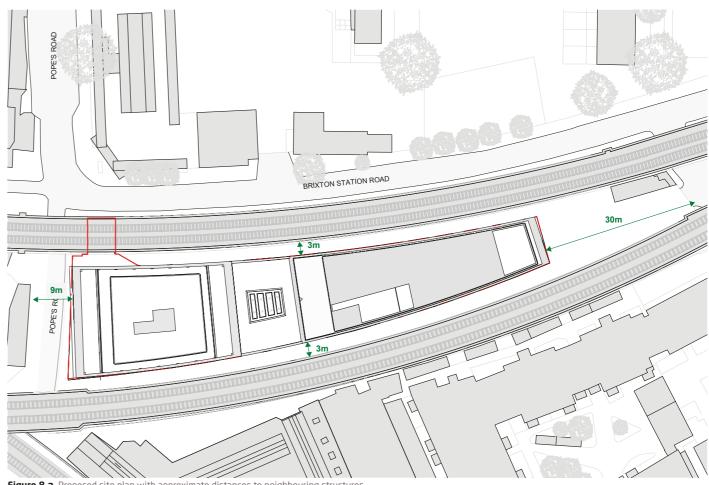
Proposed site plan with approximate distances to neighbouring structures
